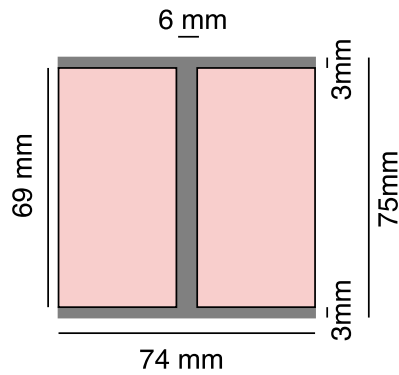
Diagram illustrating section of the steel beam filled with PIR
